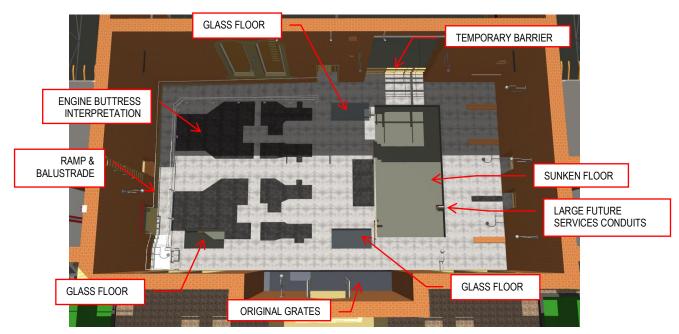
Proposed CHEH Engine Room, birds-eye view with roof removed, 3D Architectural Model. (Colours/materials in the image are not indicative of reality). The new floor slab provides a level floor surface and encapsulates the asbestos hazard below. Engine buttresses are interpreted, and glass floor panels provide a view to the subfloor. Original grates are reinstalled in the door niche, and the sunken floor section is left in place to provide options for a future fitout.
